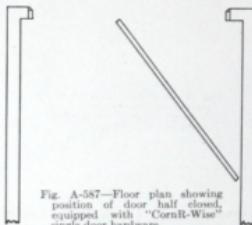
Floor plan showing door half closed, equipped with "CornR-Wise" single door hardware.
